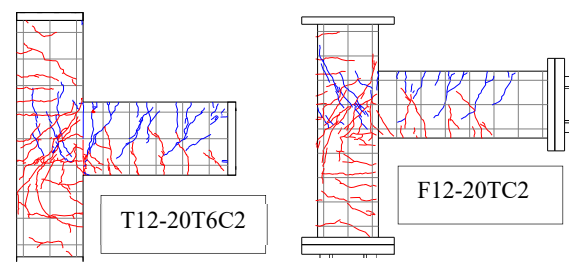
Cracking patterns at 2.0% drift of (a) T12-20T6C2 subassembly joint; (b) F12-20T6C2 frame joint.
